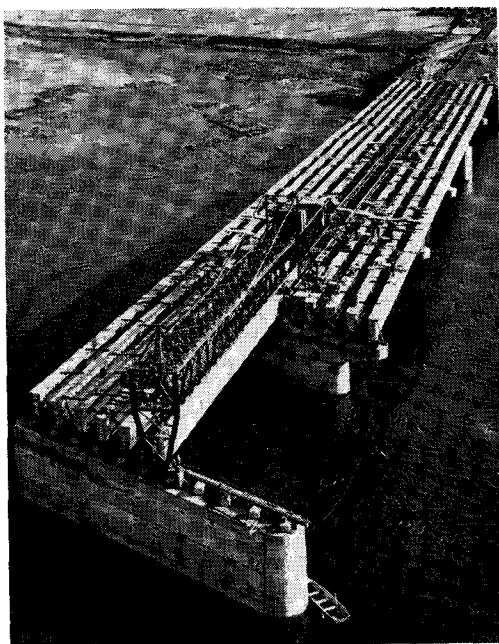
(Above)—Construction View of Champlain Bridge Showing Launching Bridge for Placing 176-Ft. Spans
